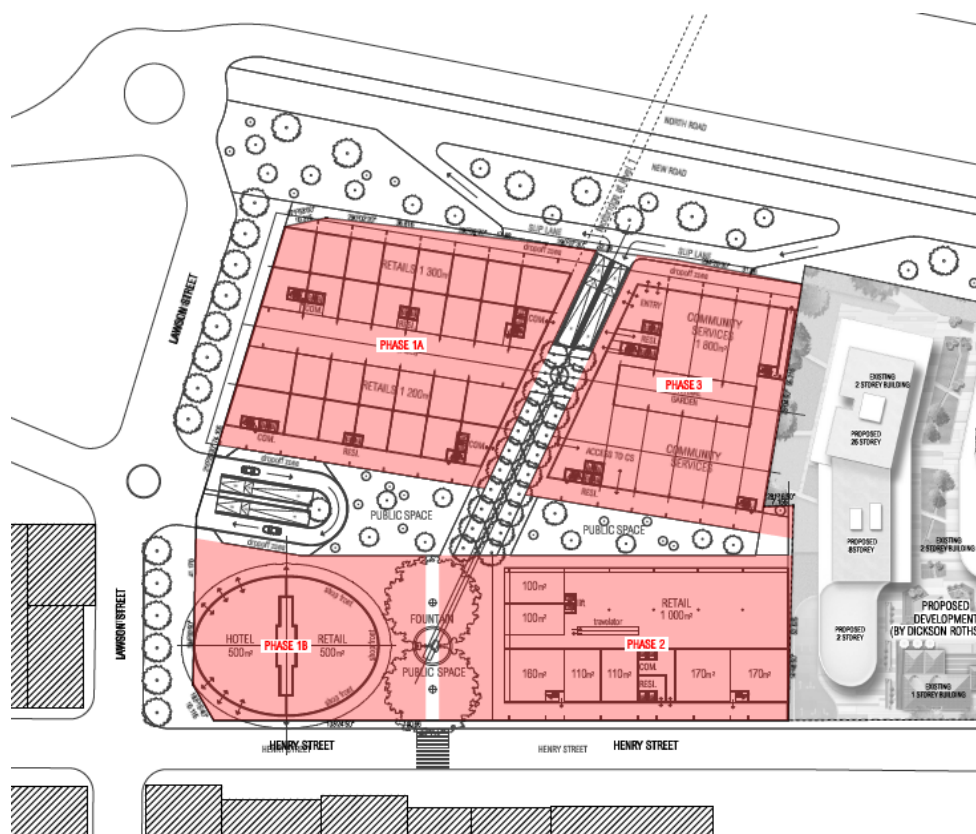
Development Staging (Architectural Plan Rev X, 29/11/19)
